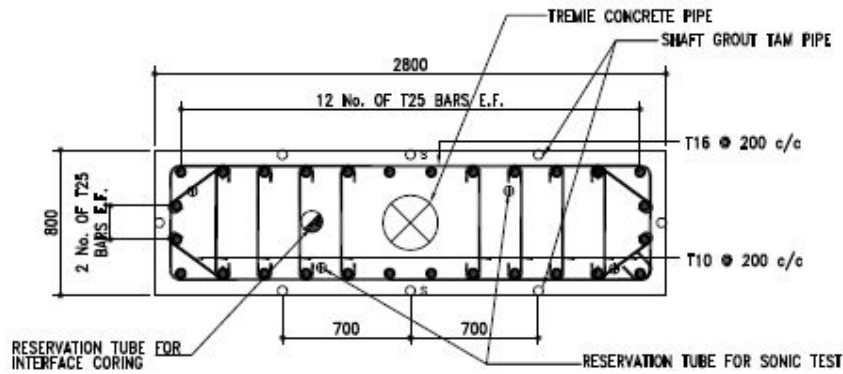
Typical grout pipe arrangement of shaft-grouted barrette
